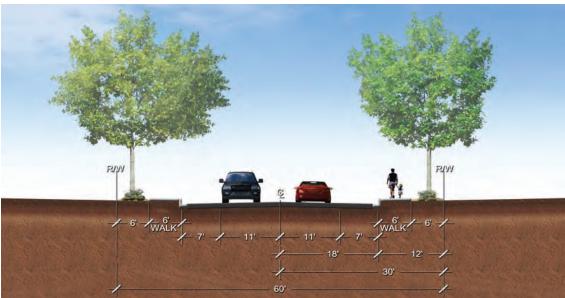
| Existing Road(s) Section (60' R.O.W.)
